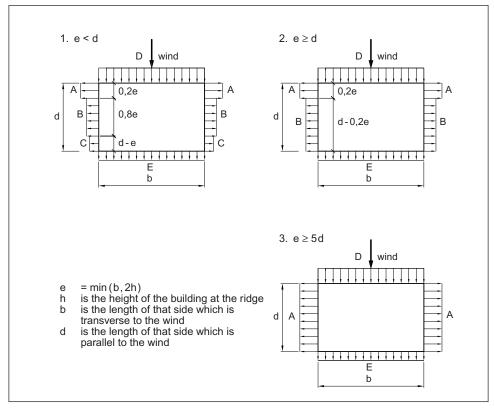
Zones A...E for vertical walls, plan view [9...12]
